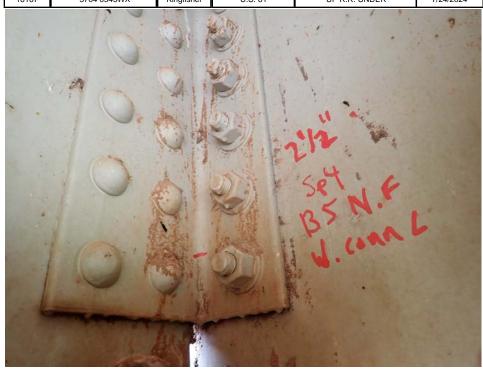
Looking northeast at the beam 4, span 3 southwest connection angle to the pier beam at pier 3. Note: 5 3/4-inch-long vertical paint crack at the bottom of the connection angle.
